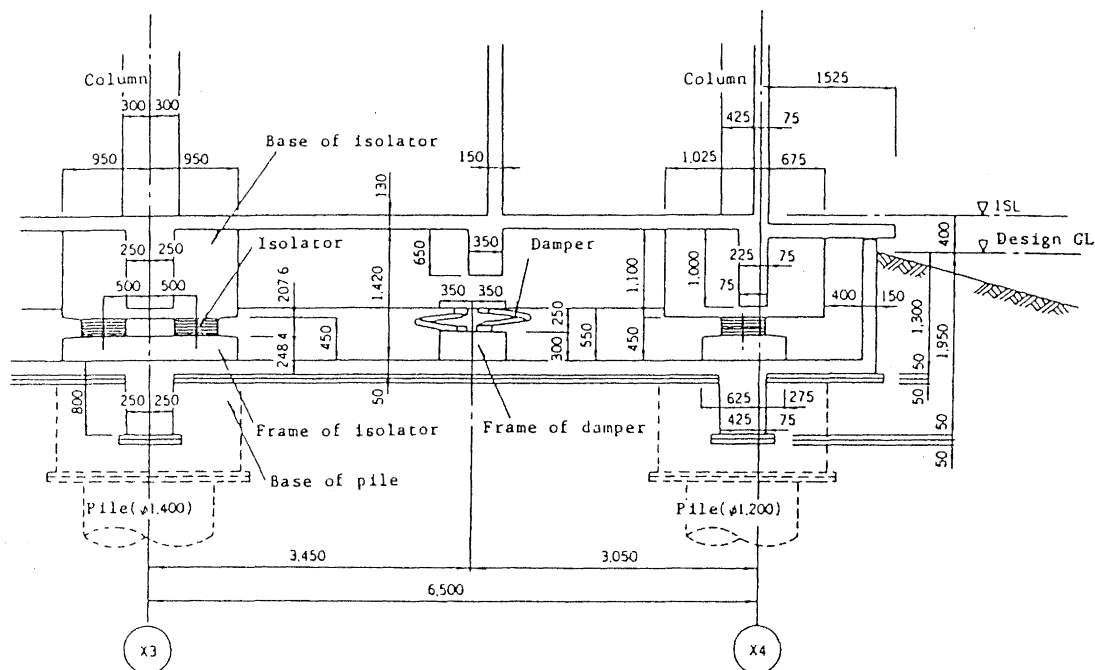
BENT BAR DAMPERS USED IN AN ISOLATION SYSTEM
